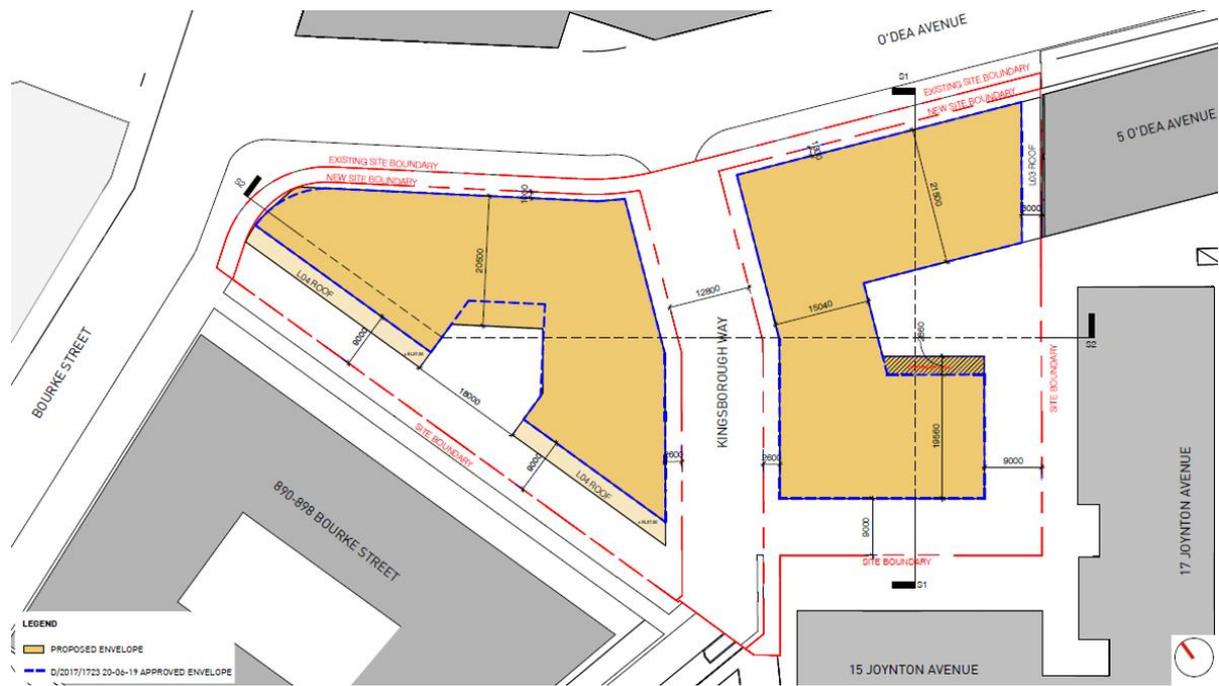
Proposed level 4 and 5 envelope plan. Approved concept building envelope outlined in blue.
